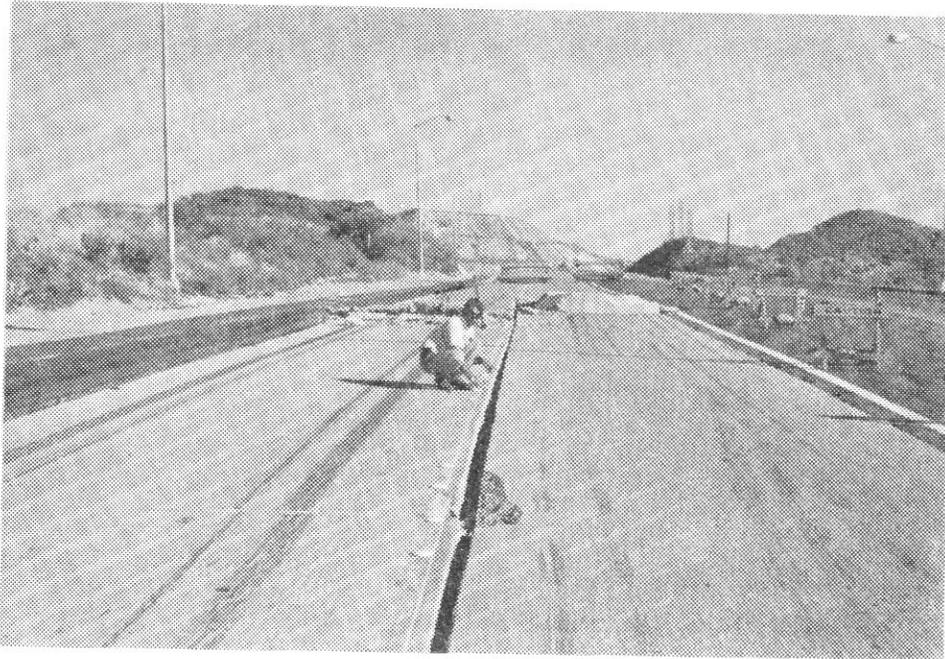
Slab separation along longitudinal joint due to lateral fill movement.
